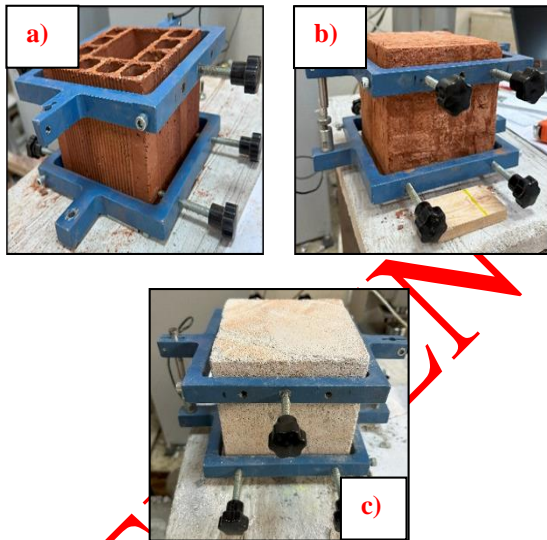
Mechanism used for the determination of stress-strain relations of masonry units: a)hollow brick, b) clay brick, c) aerated concrete
